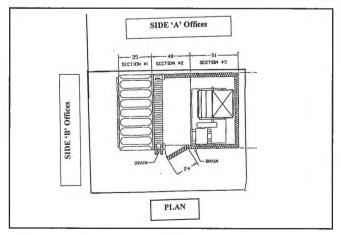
Layout Plan of the Compartment Unit and Adjacent Offices.
